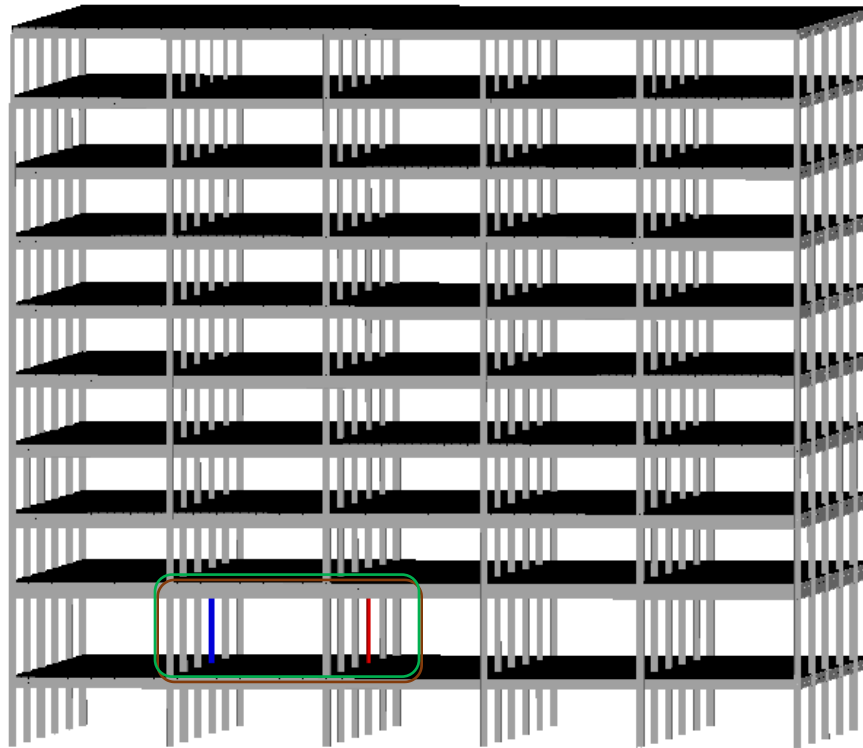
Finite Element simulation in ABAQUS of the 3D steel and concrete composite structure. Damage distribution between columns C3 and B3 in the first floor of the building
